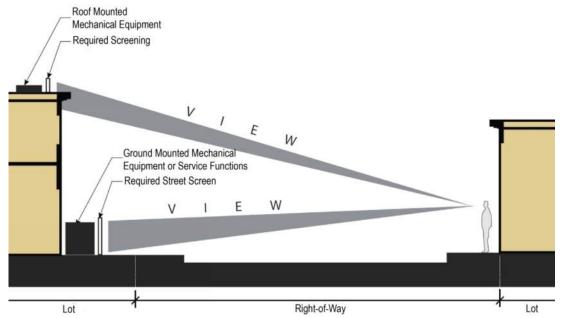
Illustration showing required screening of roof and ground mounted equipment
